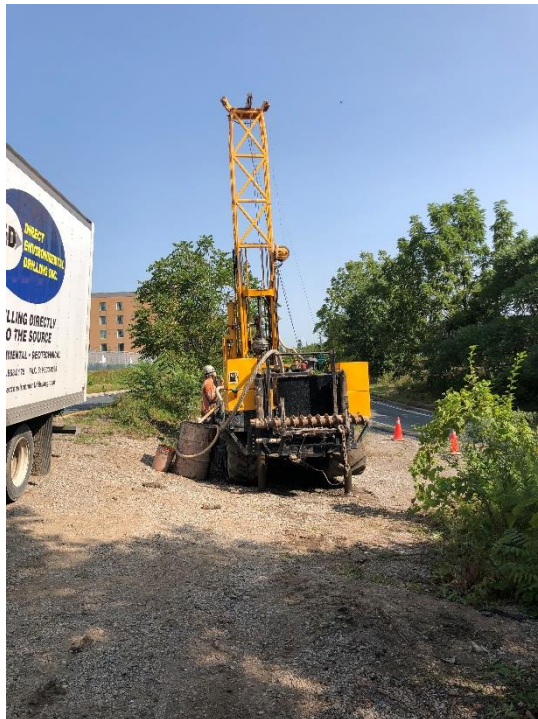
Greenspace on west side of Highway 403 East Ramp from Main St. W (looking southwest), September 6, 2023
